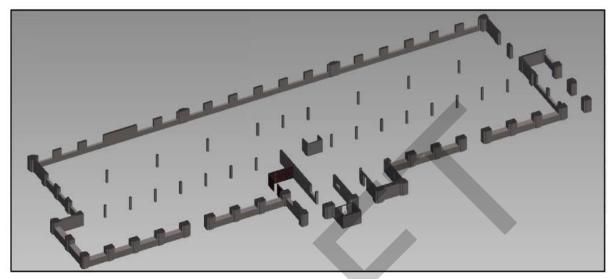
Cutaway showing walls and columns at the ground floor level at GNS
